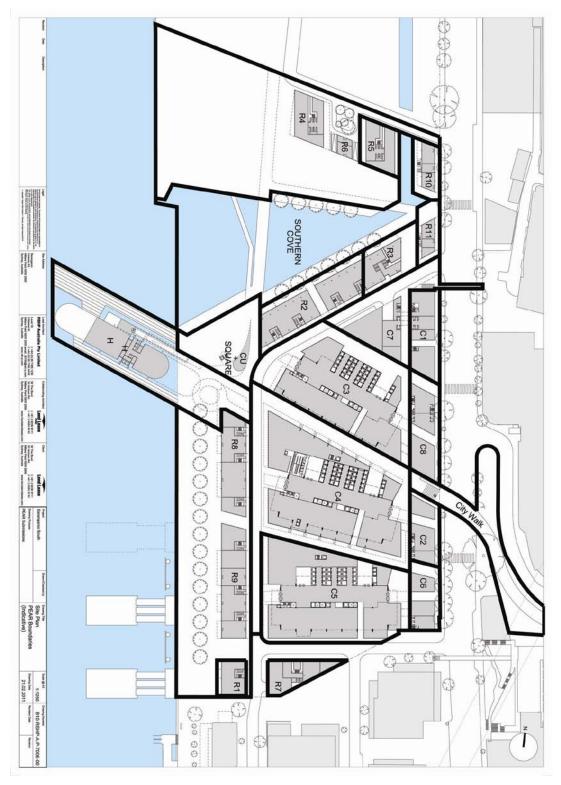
Overall site plan showing preliminary Project Application site boundaries
